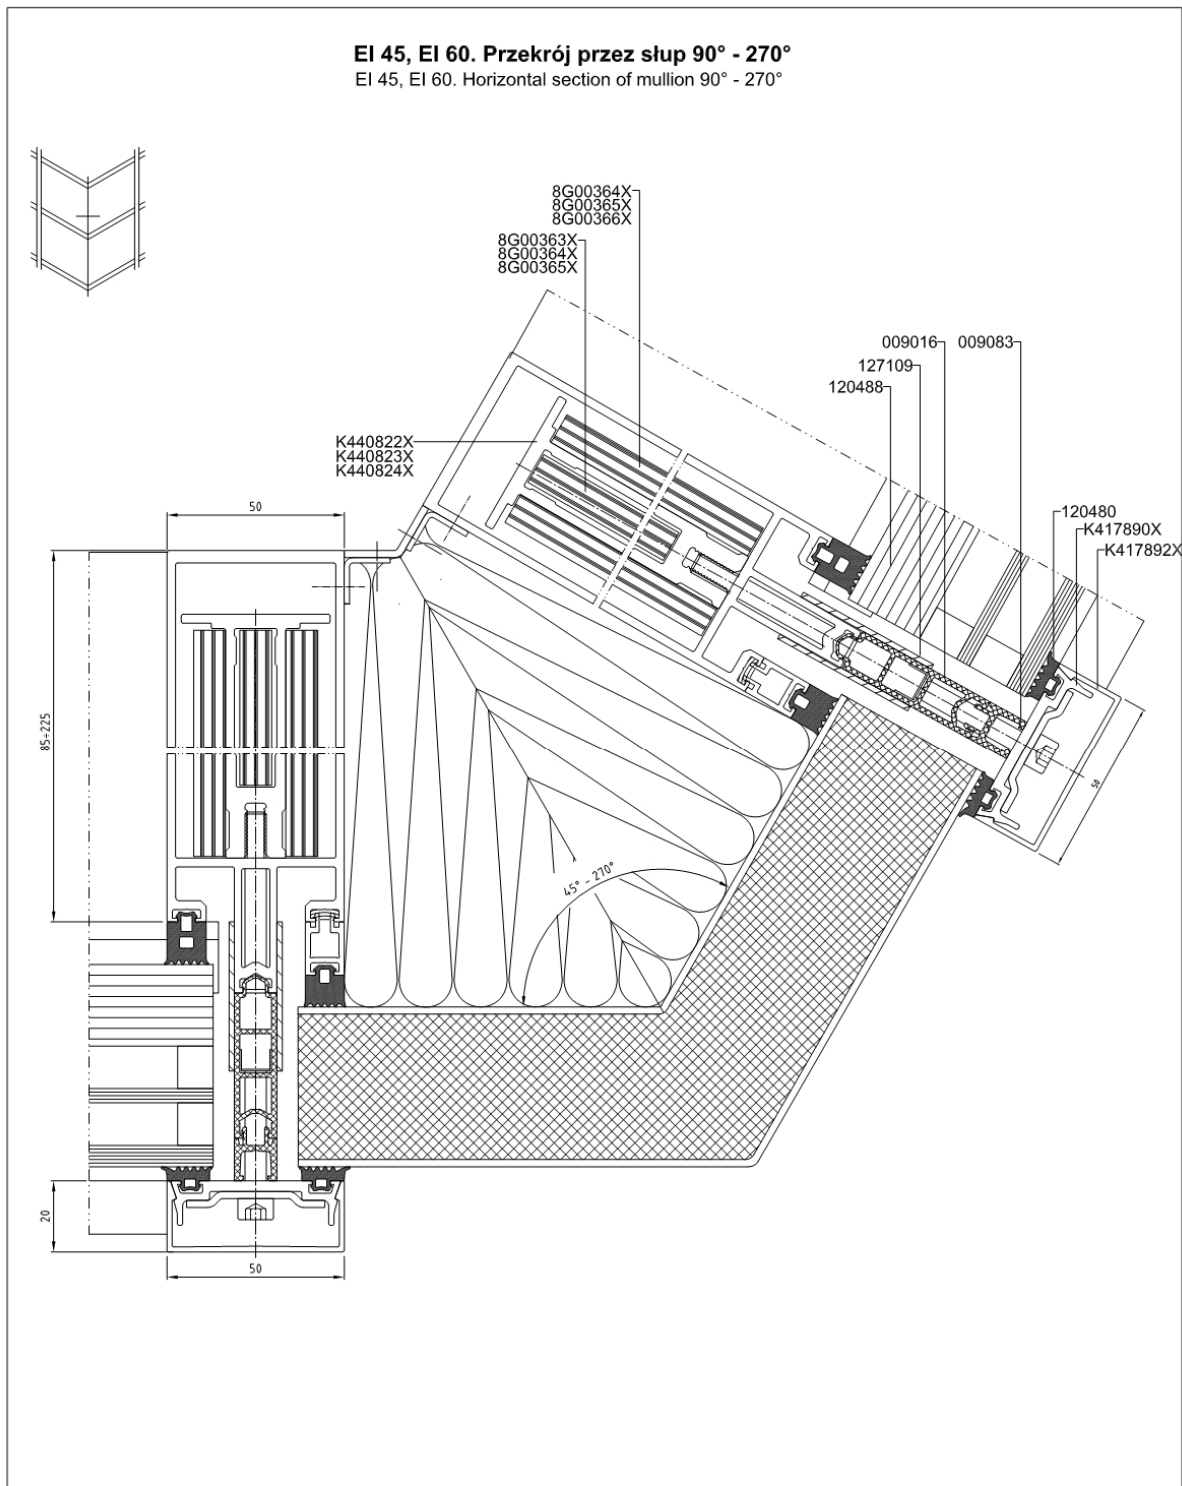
Typical cross-section through the corner of MB-SR50N EI EI60 system curtain wall
